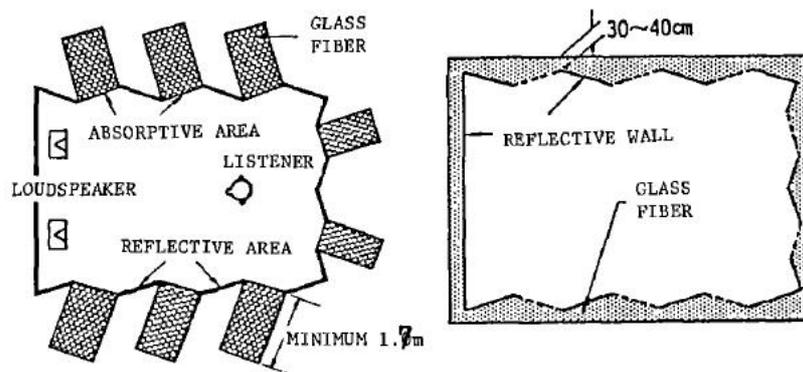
Basic construction of the listening room (left) and its space saving alternative (right) [2]
